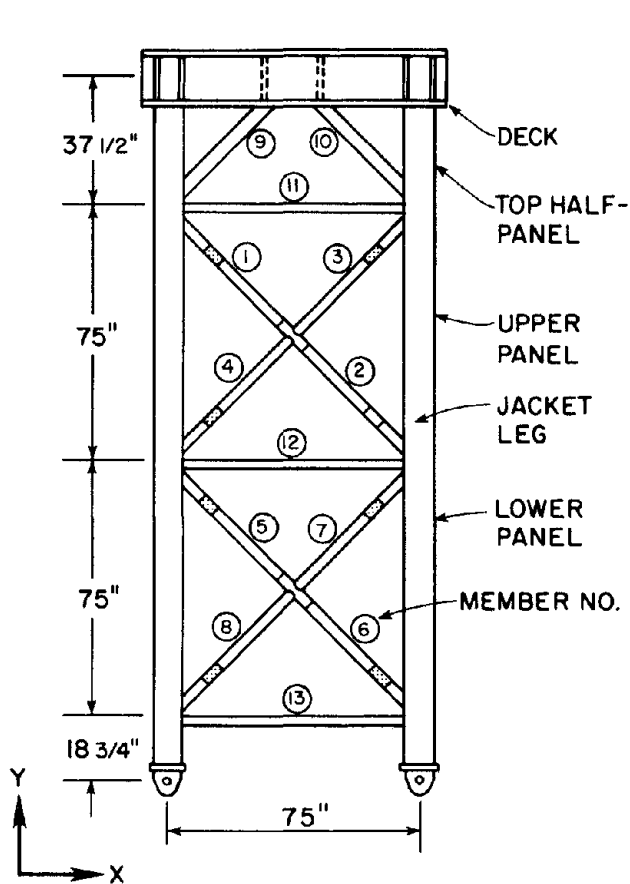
Elevation View of the API Frame [33] (1 in. = 2.54 mm)
